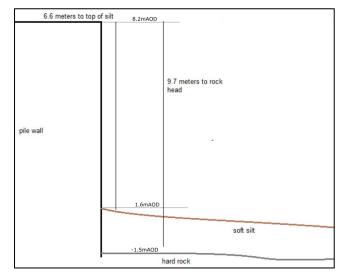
Indicative Cross-Section through Central Section of Harbour Wall
